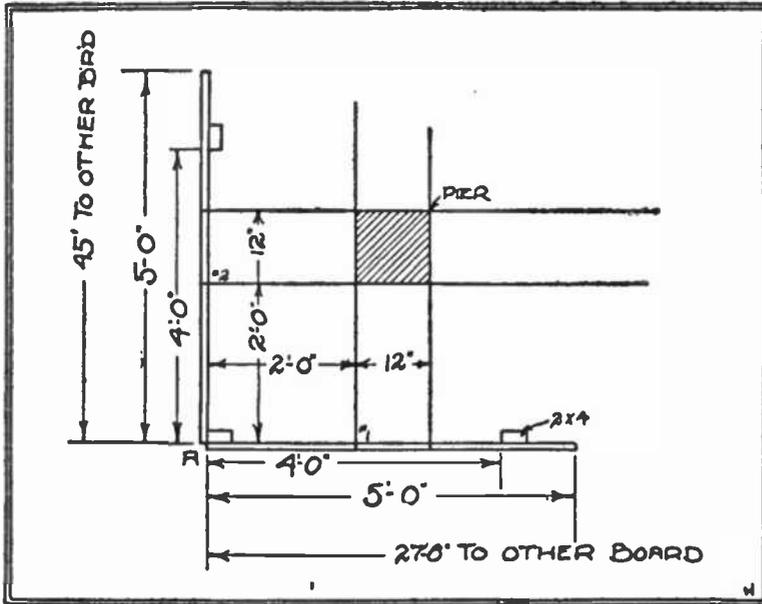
Ground Plan, Showing the Lay-out at Corners.
